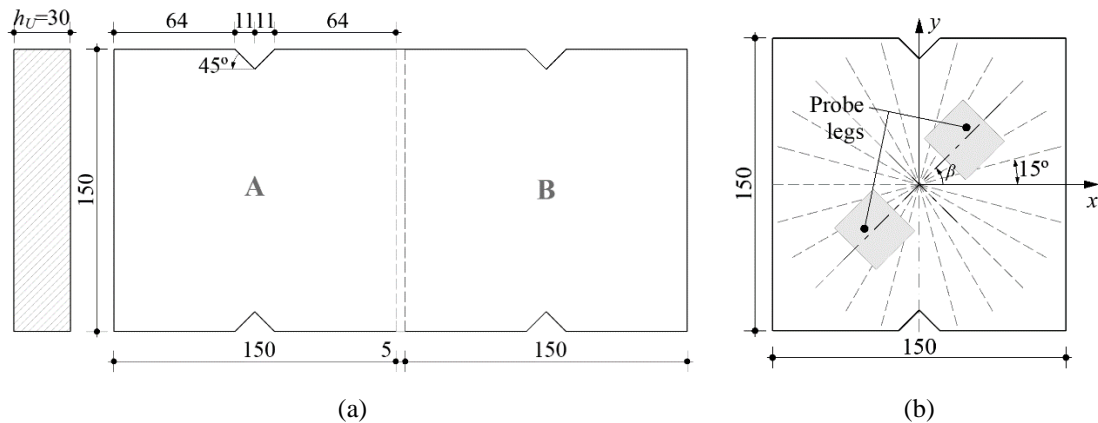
DEWST specimens: (a) Dimensions of the mould for two identical specimens; (b) scheme of the probe measurement and notation.
